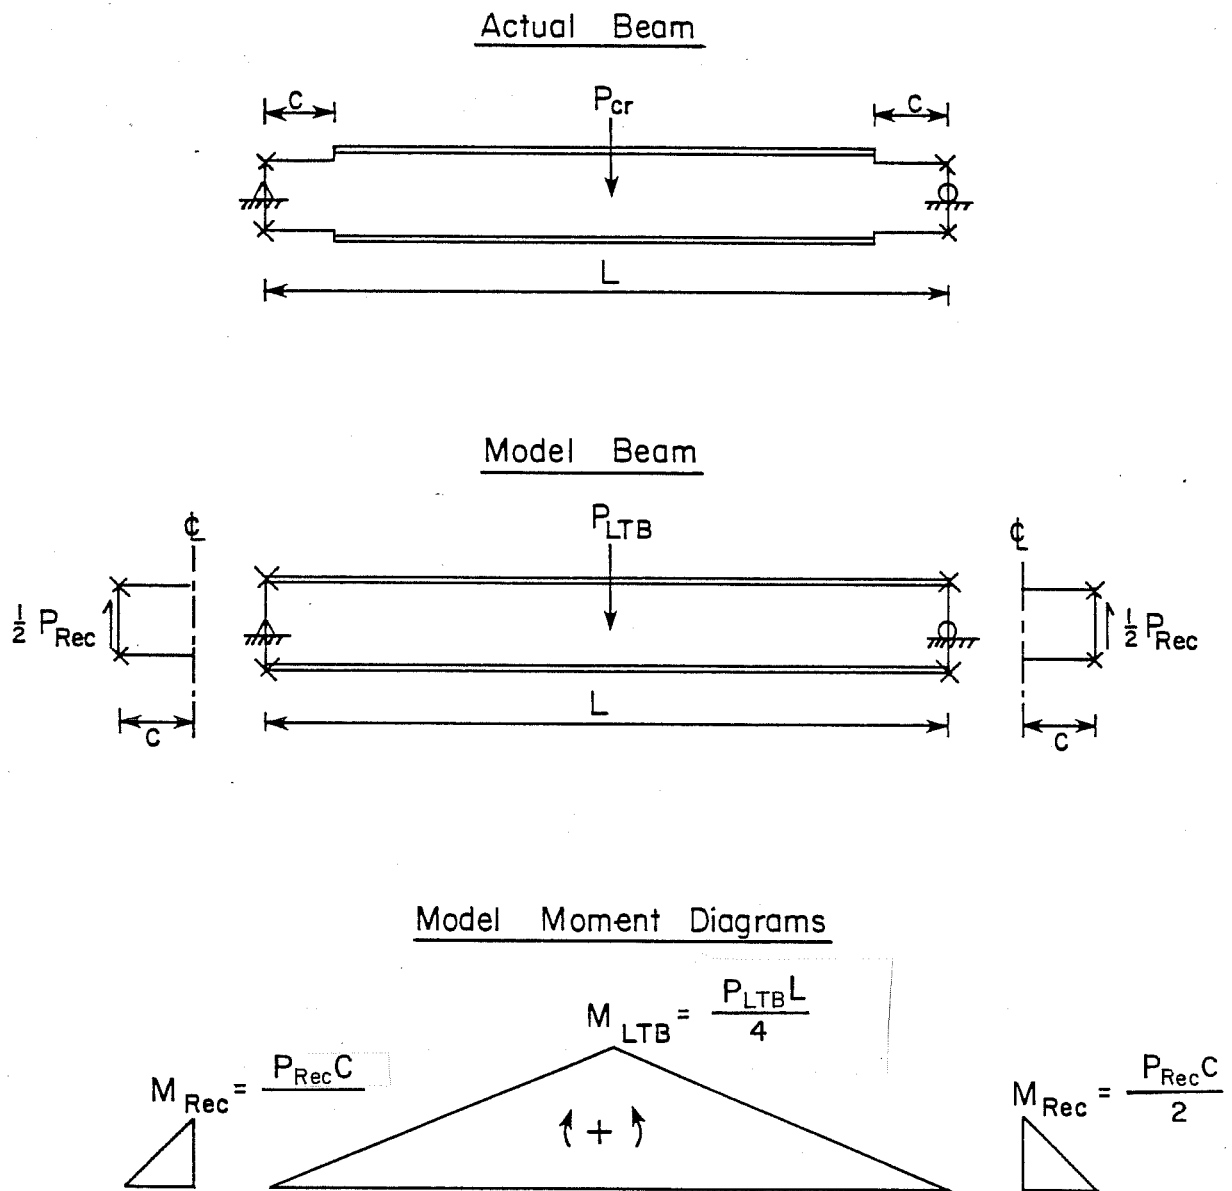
Preliminary Design Model for Double Flange Coped Beams
